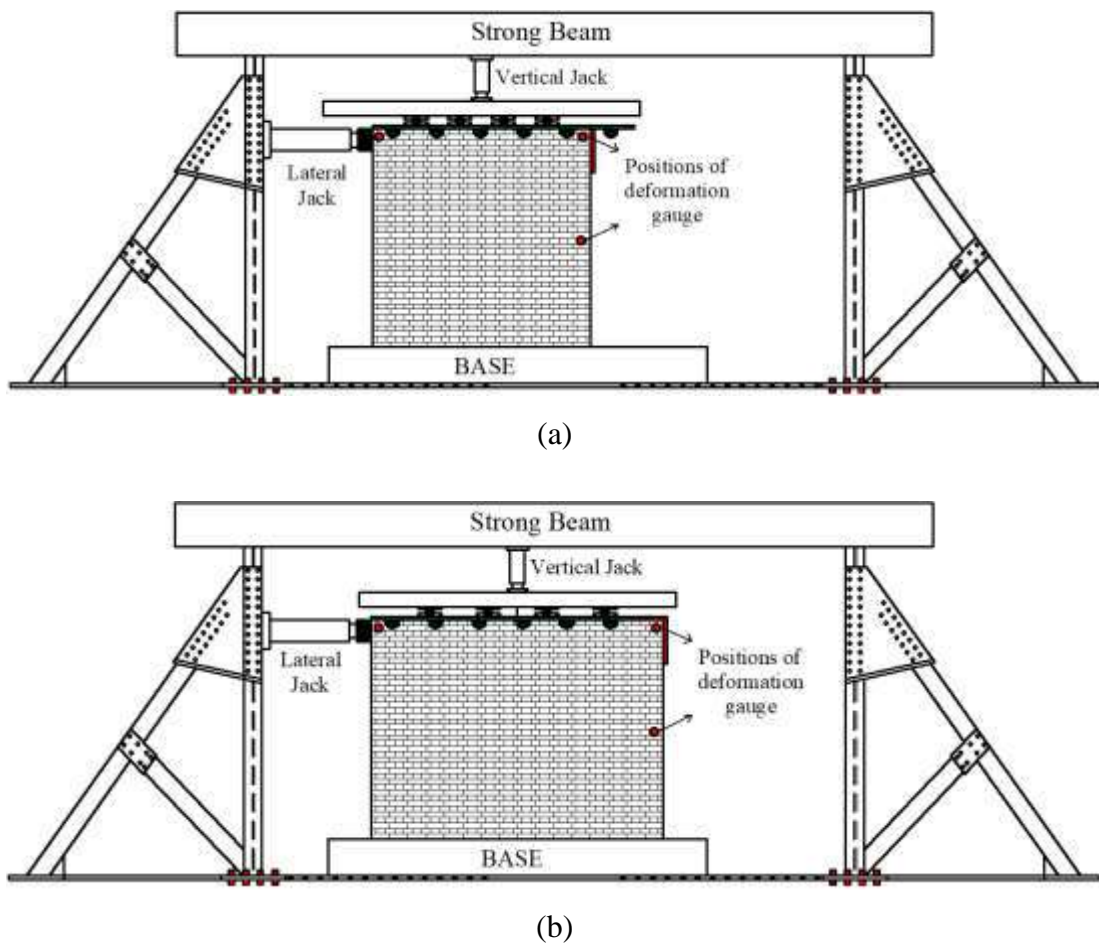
Schematic diagram of loading and testing arrangement of masonry walls, (a) Short wall, (b) Long Wall
